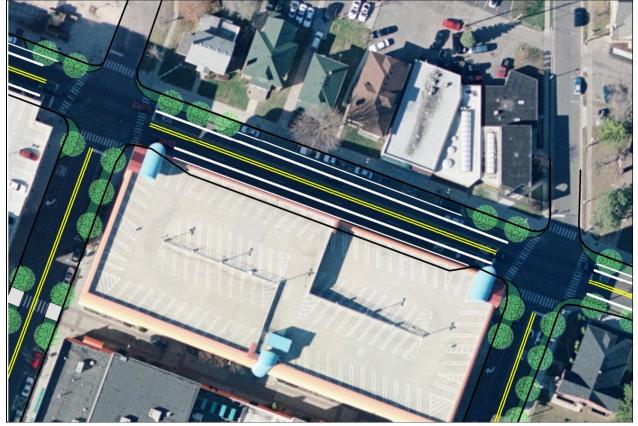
D. Albert Avenue- Charles Street to Division Street
